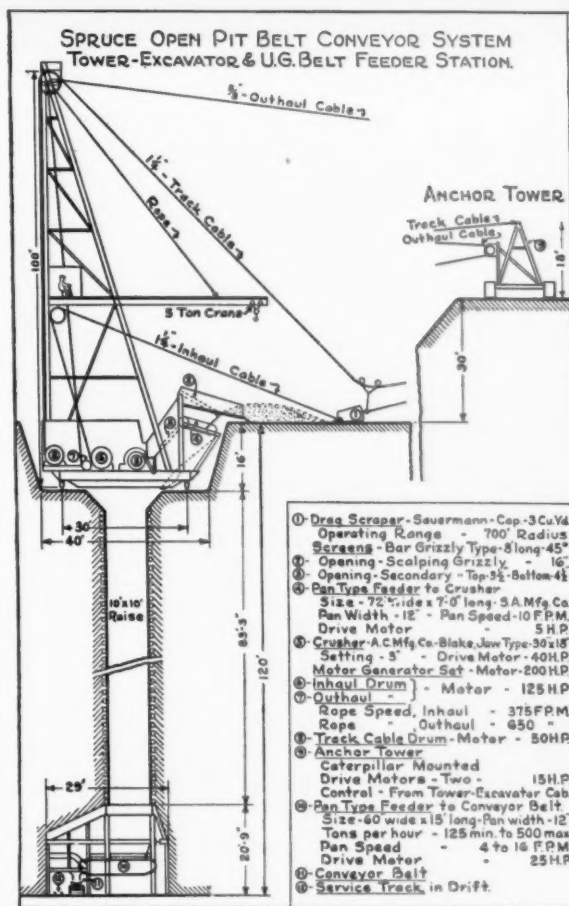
Tower excavator assembly used at Raises No. 1 and No. 2
